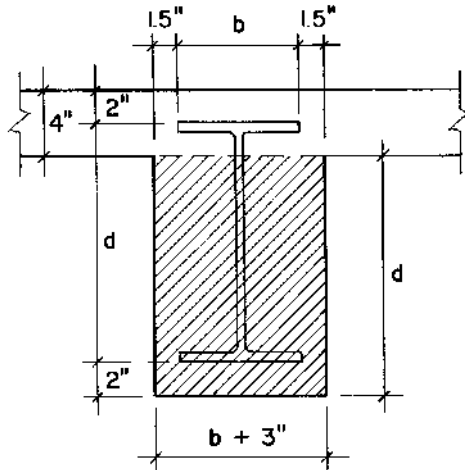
Steel beam encased in concrete for fire protection. Shaded portion indicates concrete in excess of that required for the supported concrete slab.
